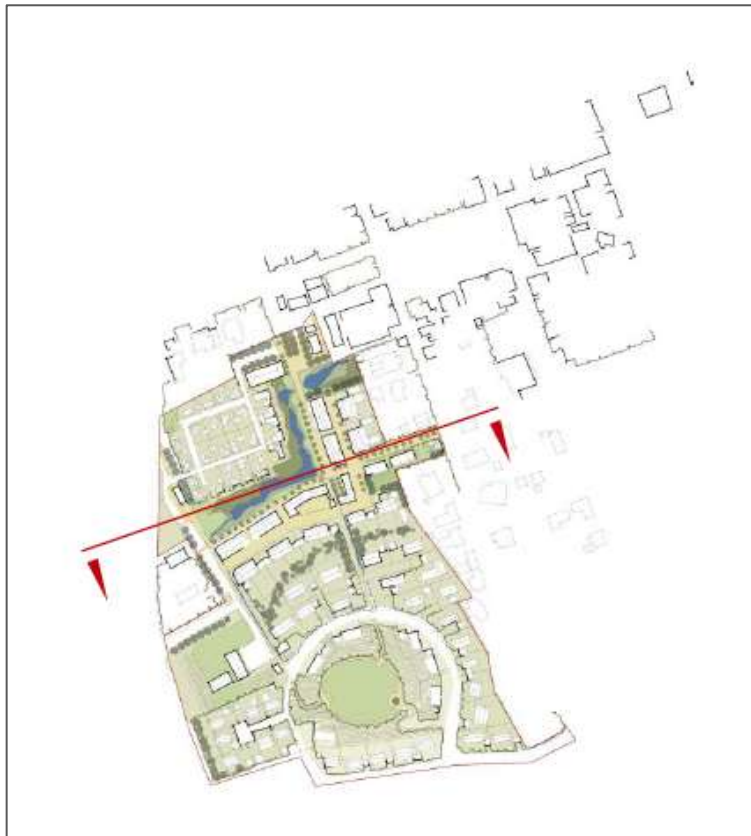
Site Section BB from Church Street [R311] (1) to Fontein Street (2), Britz 2026
